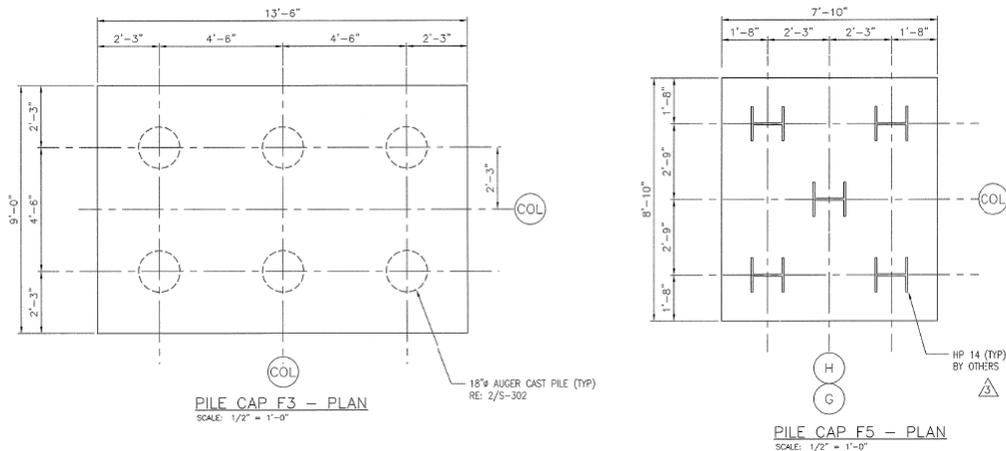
Typical 18" auger cast pile cap (left) and typical steel H pile cap (right)
